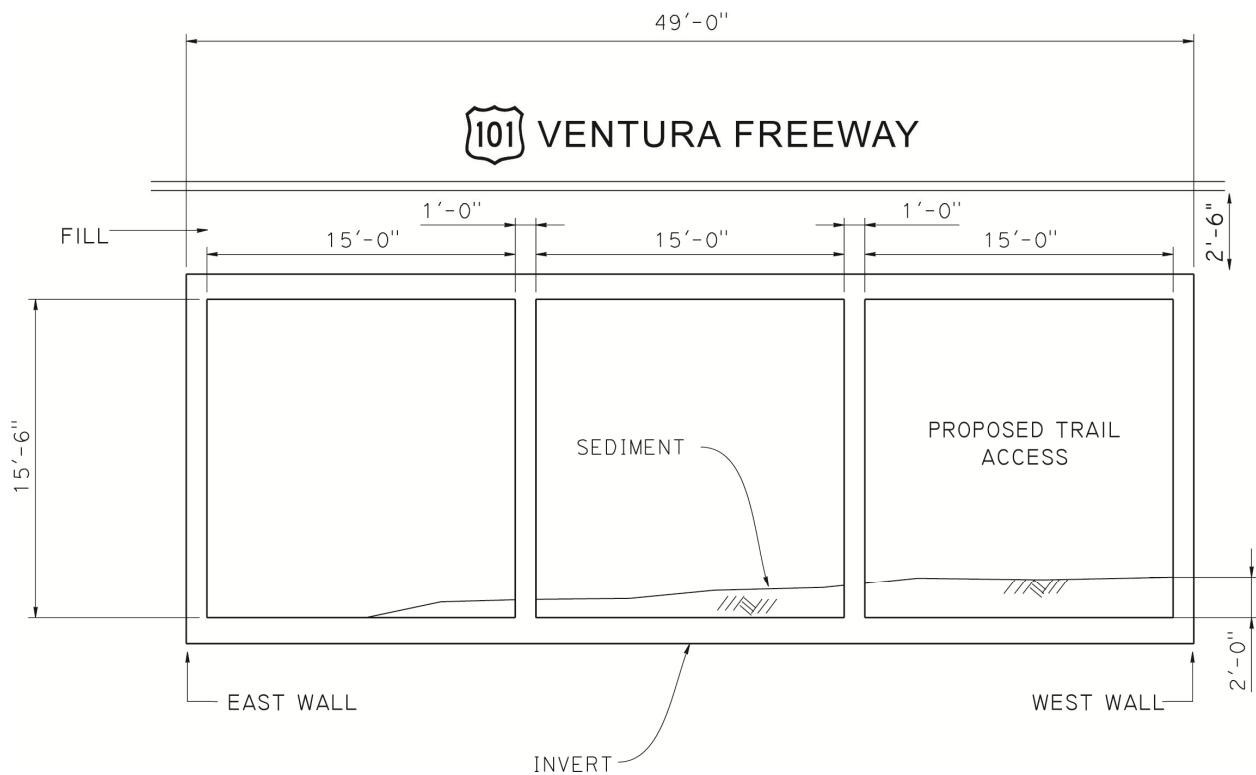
US 101 Underground Culvert (3 Cells) Cross Section
